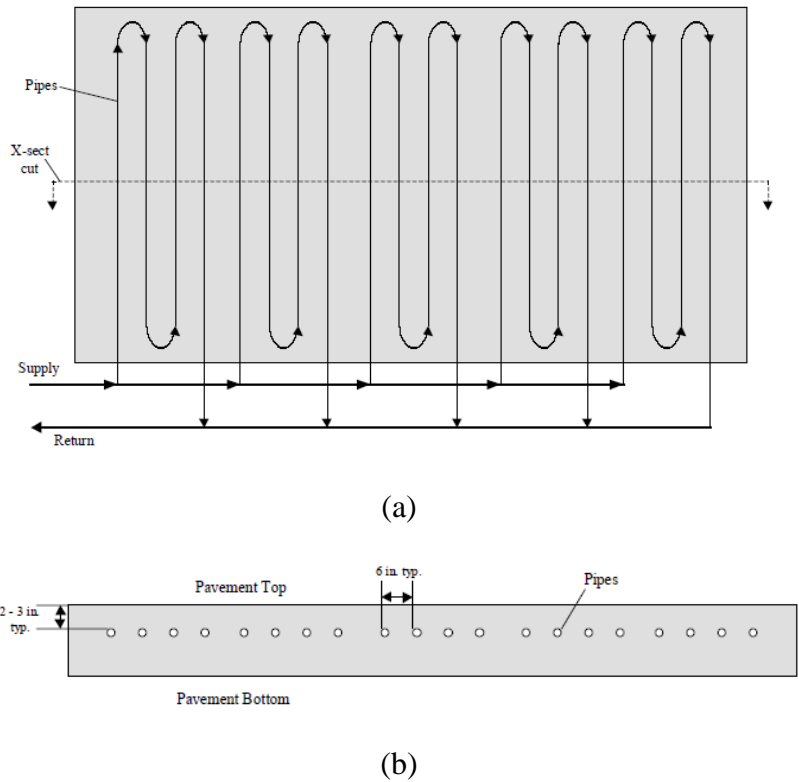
Typical hydronic snow-melting system: (a) Plan view; (b) Cross-Sectional View.
